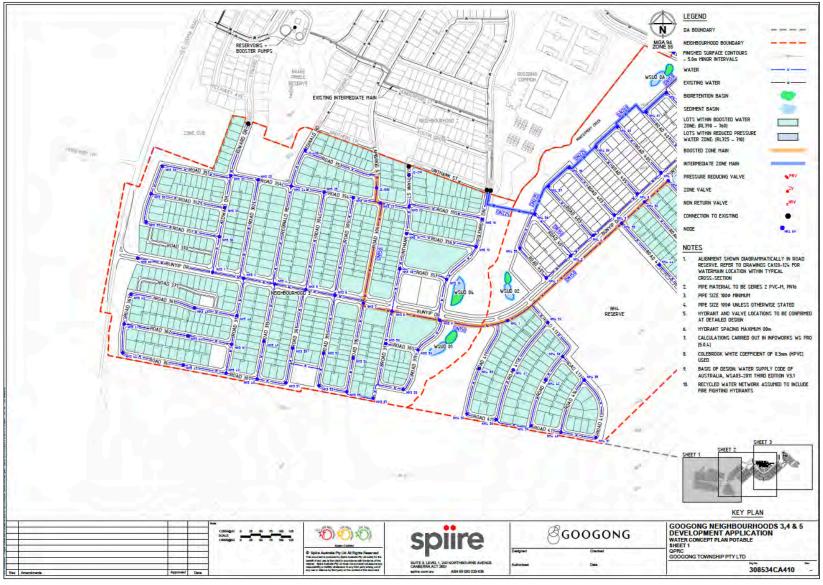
NH 1 Water Concept Plan. (Ember & Spiire, 2021)
